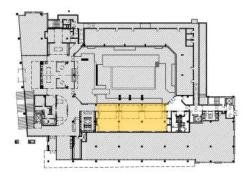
| Level 1 Floor Plan - Fitness Center + Yoga Room
